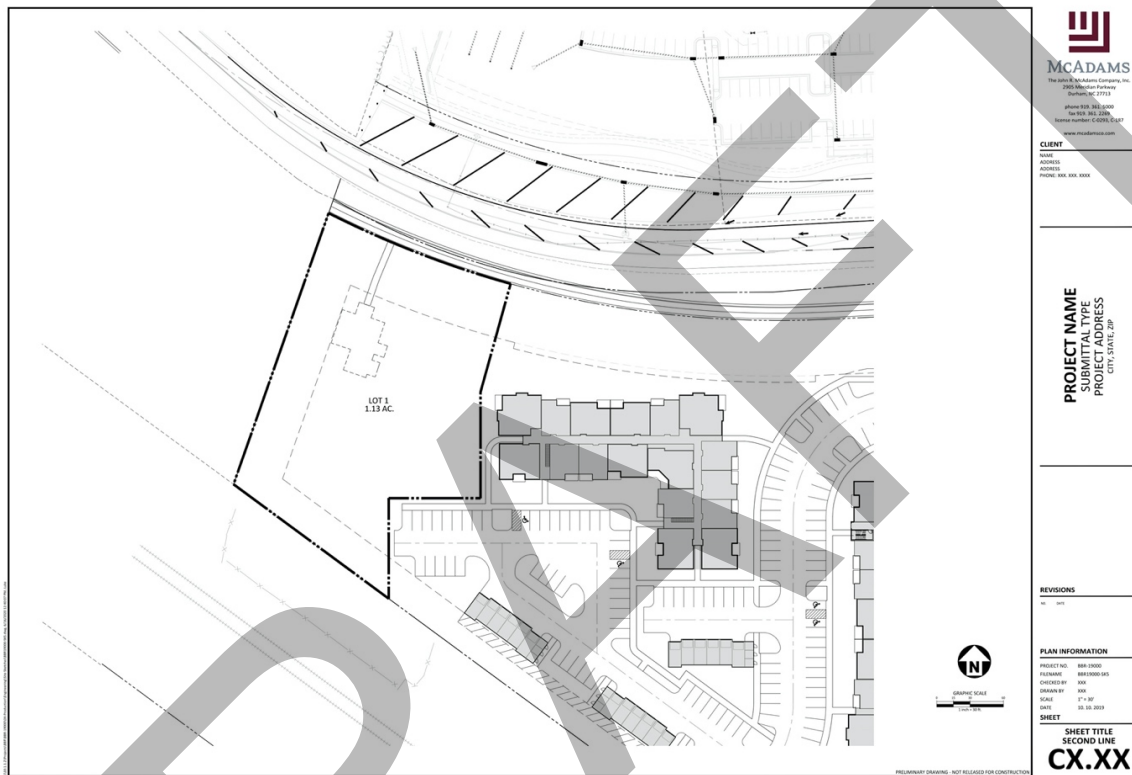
Draft site plan, showing current footprint of the house, required setbacks, and planned development on adjacent parcel.
